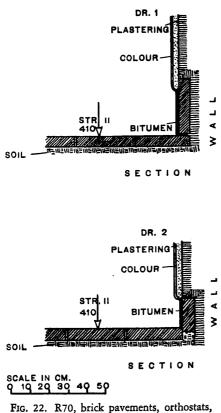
R70, brick pavements, orthostats, and wall treatment.
